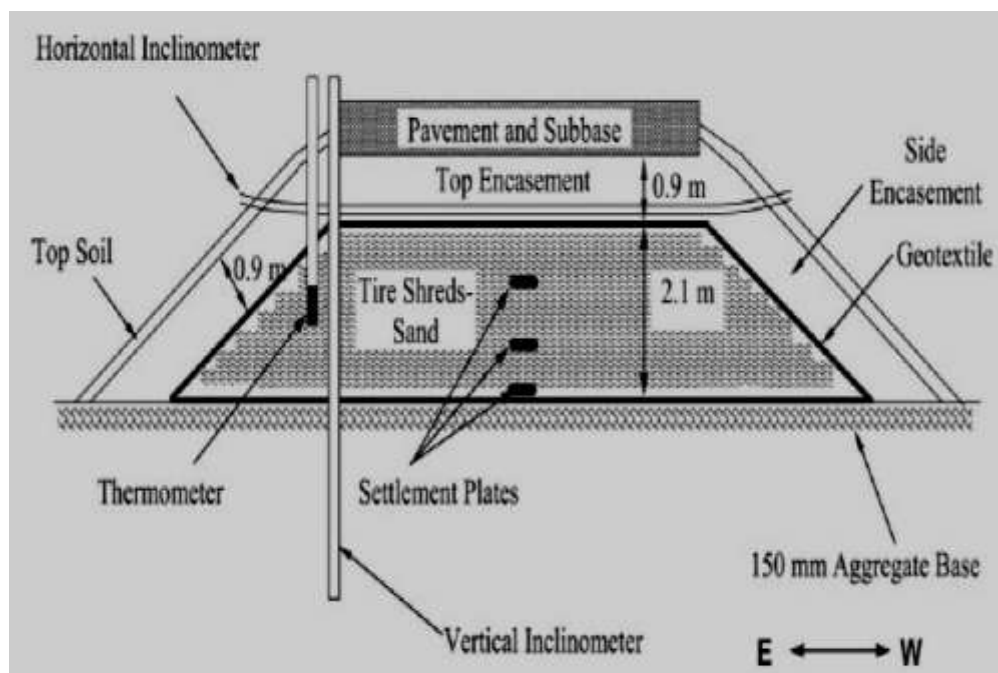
Schematic cross-section of an embankment constructed with tire shreds and sand (Yoon *et al.*, 2008).
